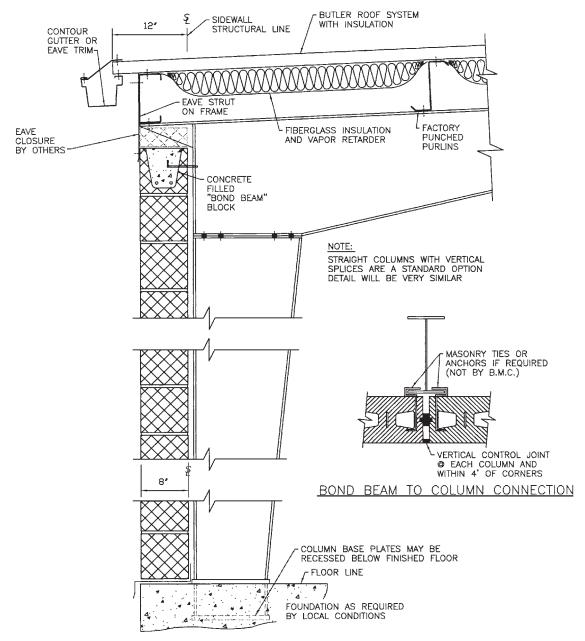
Horizontally spanning single-leaf CMU wall. (Butler Manufacturing Co.)
